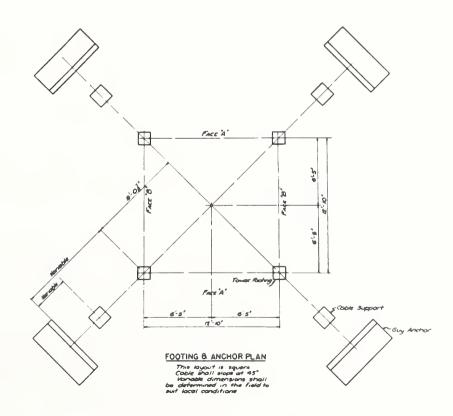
A typical tower footing plan. This was designed for a CT-2 timber lookout tower.
